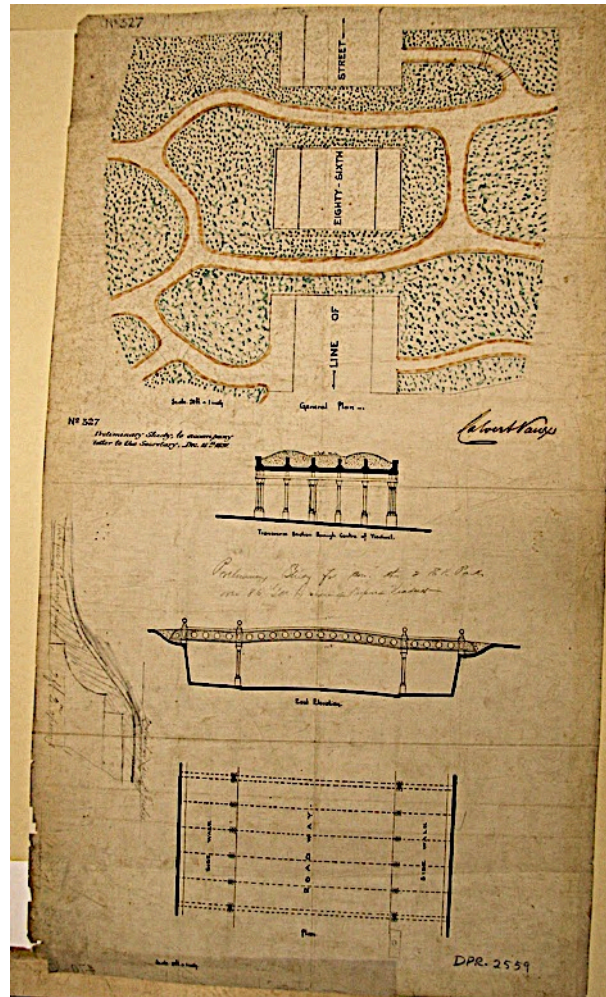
Calvert Vaux: Park & Drainage Plan, East River Park 1877 (East 84th to East 86th Streets)
